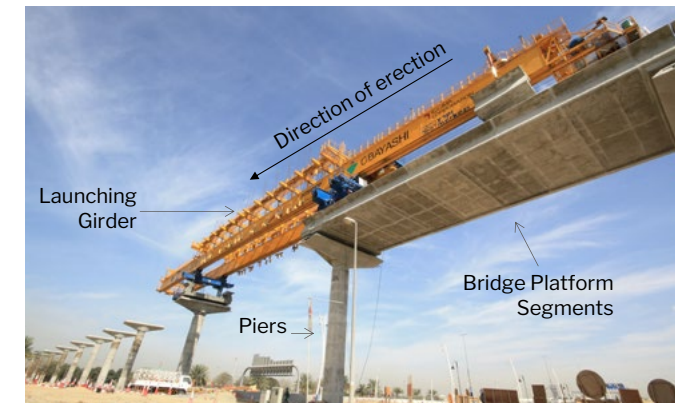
Example of typical “Span-by-Span” method of bridge construction⁹
